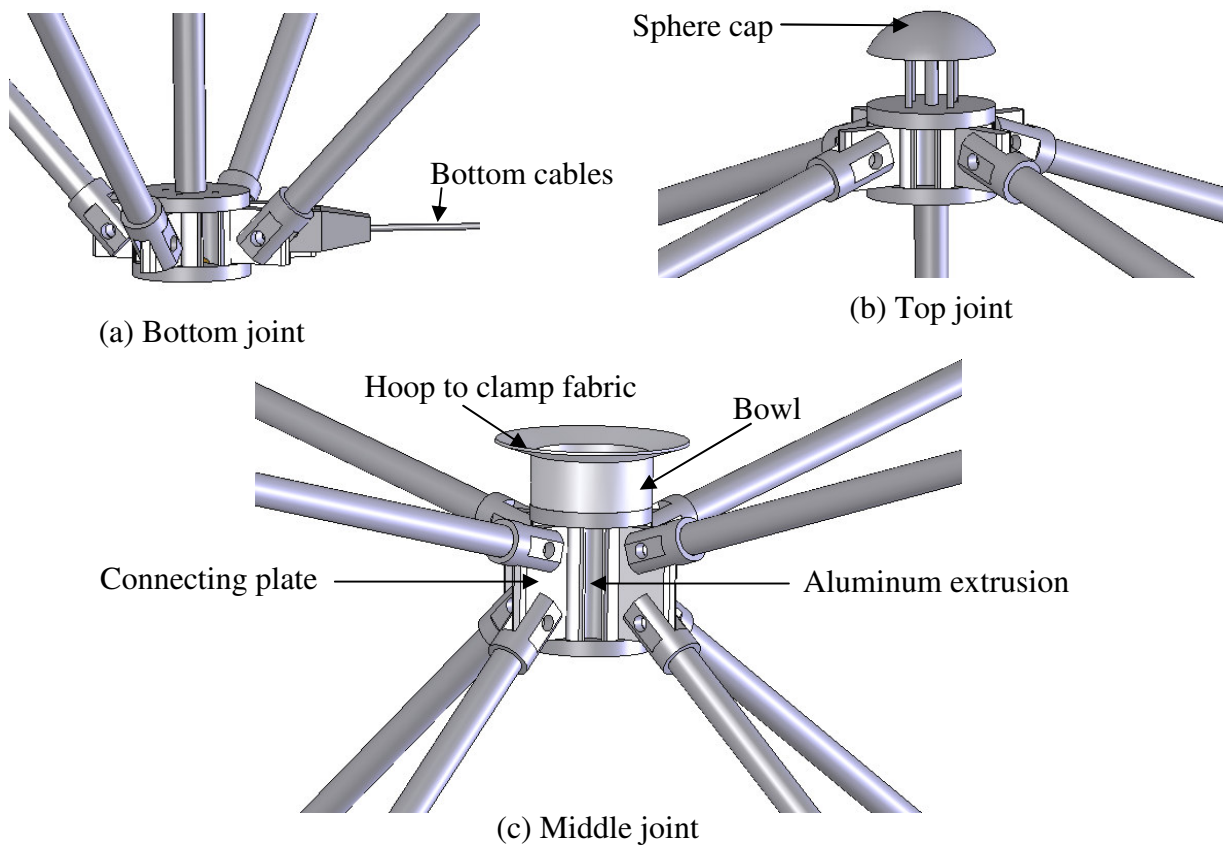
Aluminum extruded joints for Umbrella DSTMS
